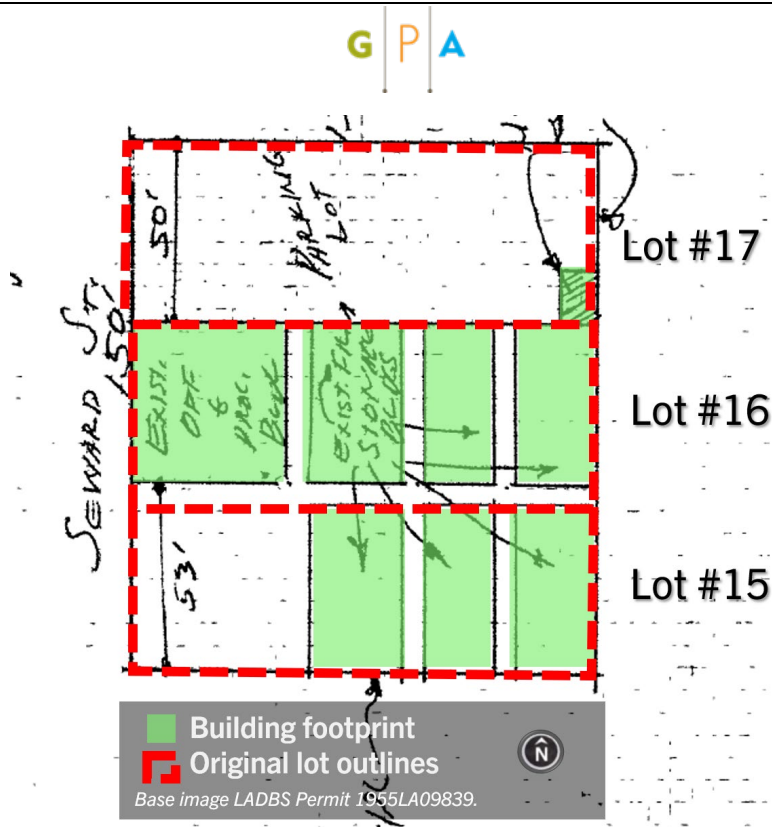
Plot plan from LADBS Permit No. 1955LA049839 showing the footprints of buildings constructed between 1951 and 1955.
